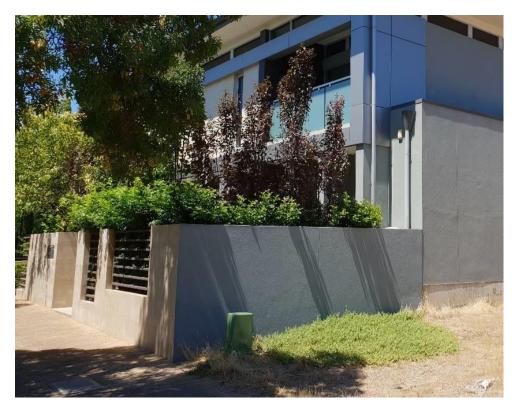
Existing wall and landscaping located adjacent boundary of eastern dwelling (223 Childers Street)
